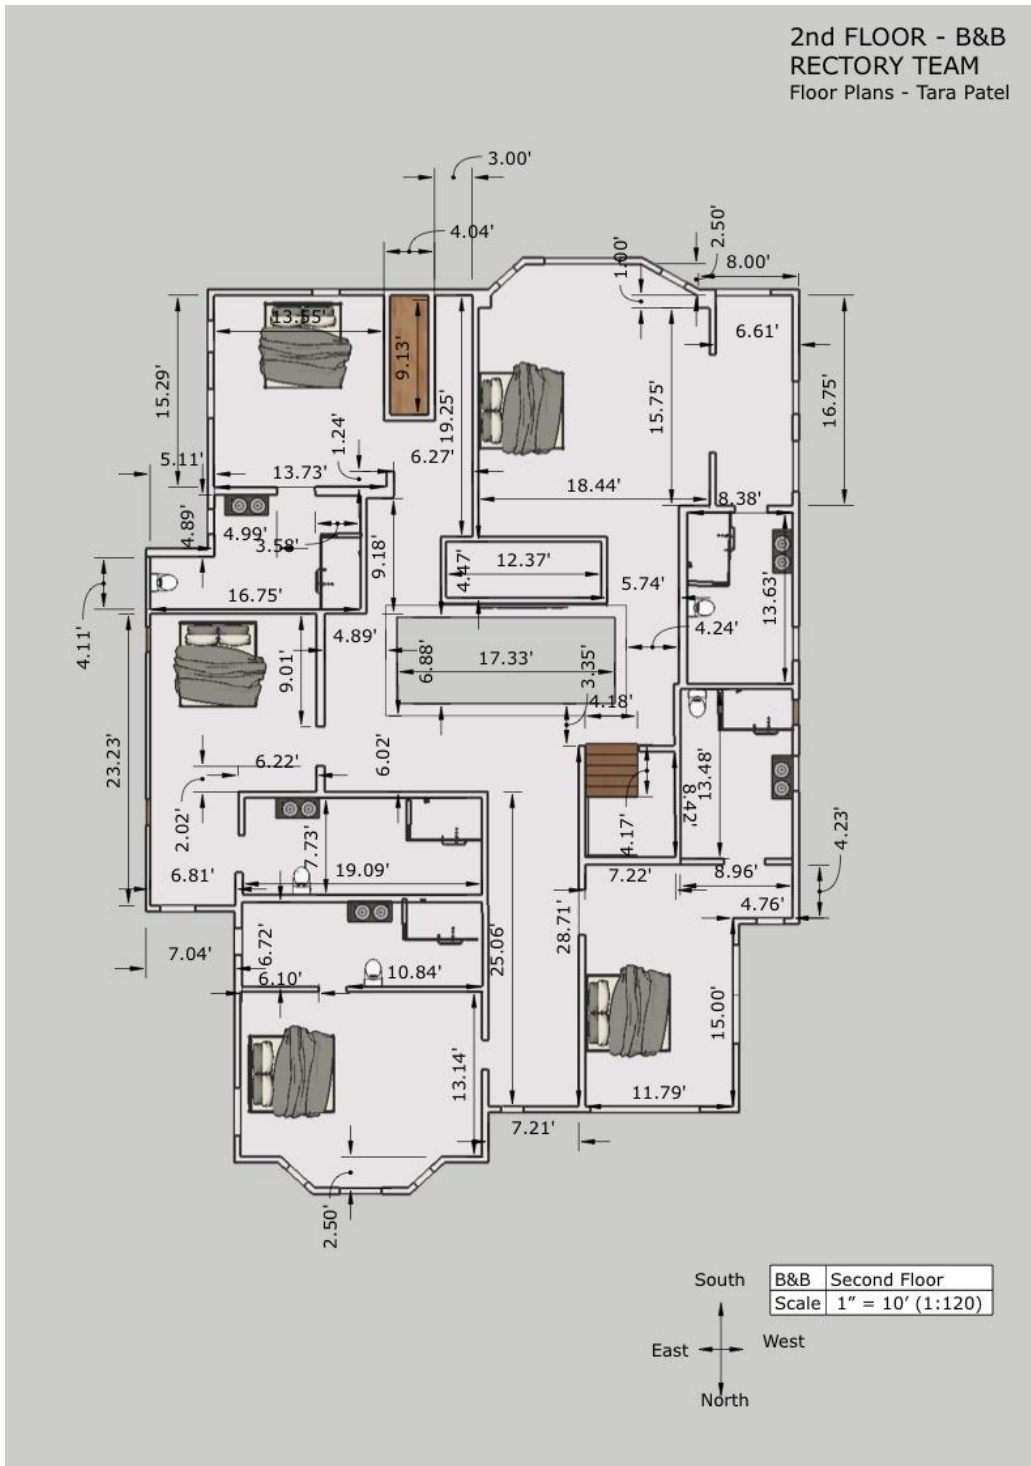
Floor plans of the second floor with the rooms and bathrooms for the B&B. The main stairway and the additional staircase from the first floor are not shown in detail. There is a partial set of stairs to the third floor (pictured).
